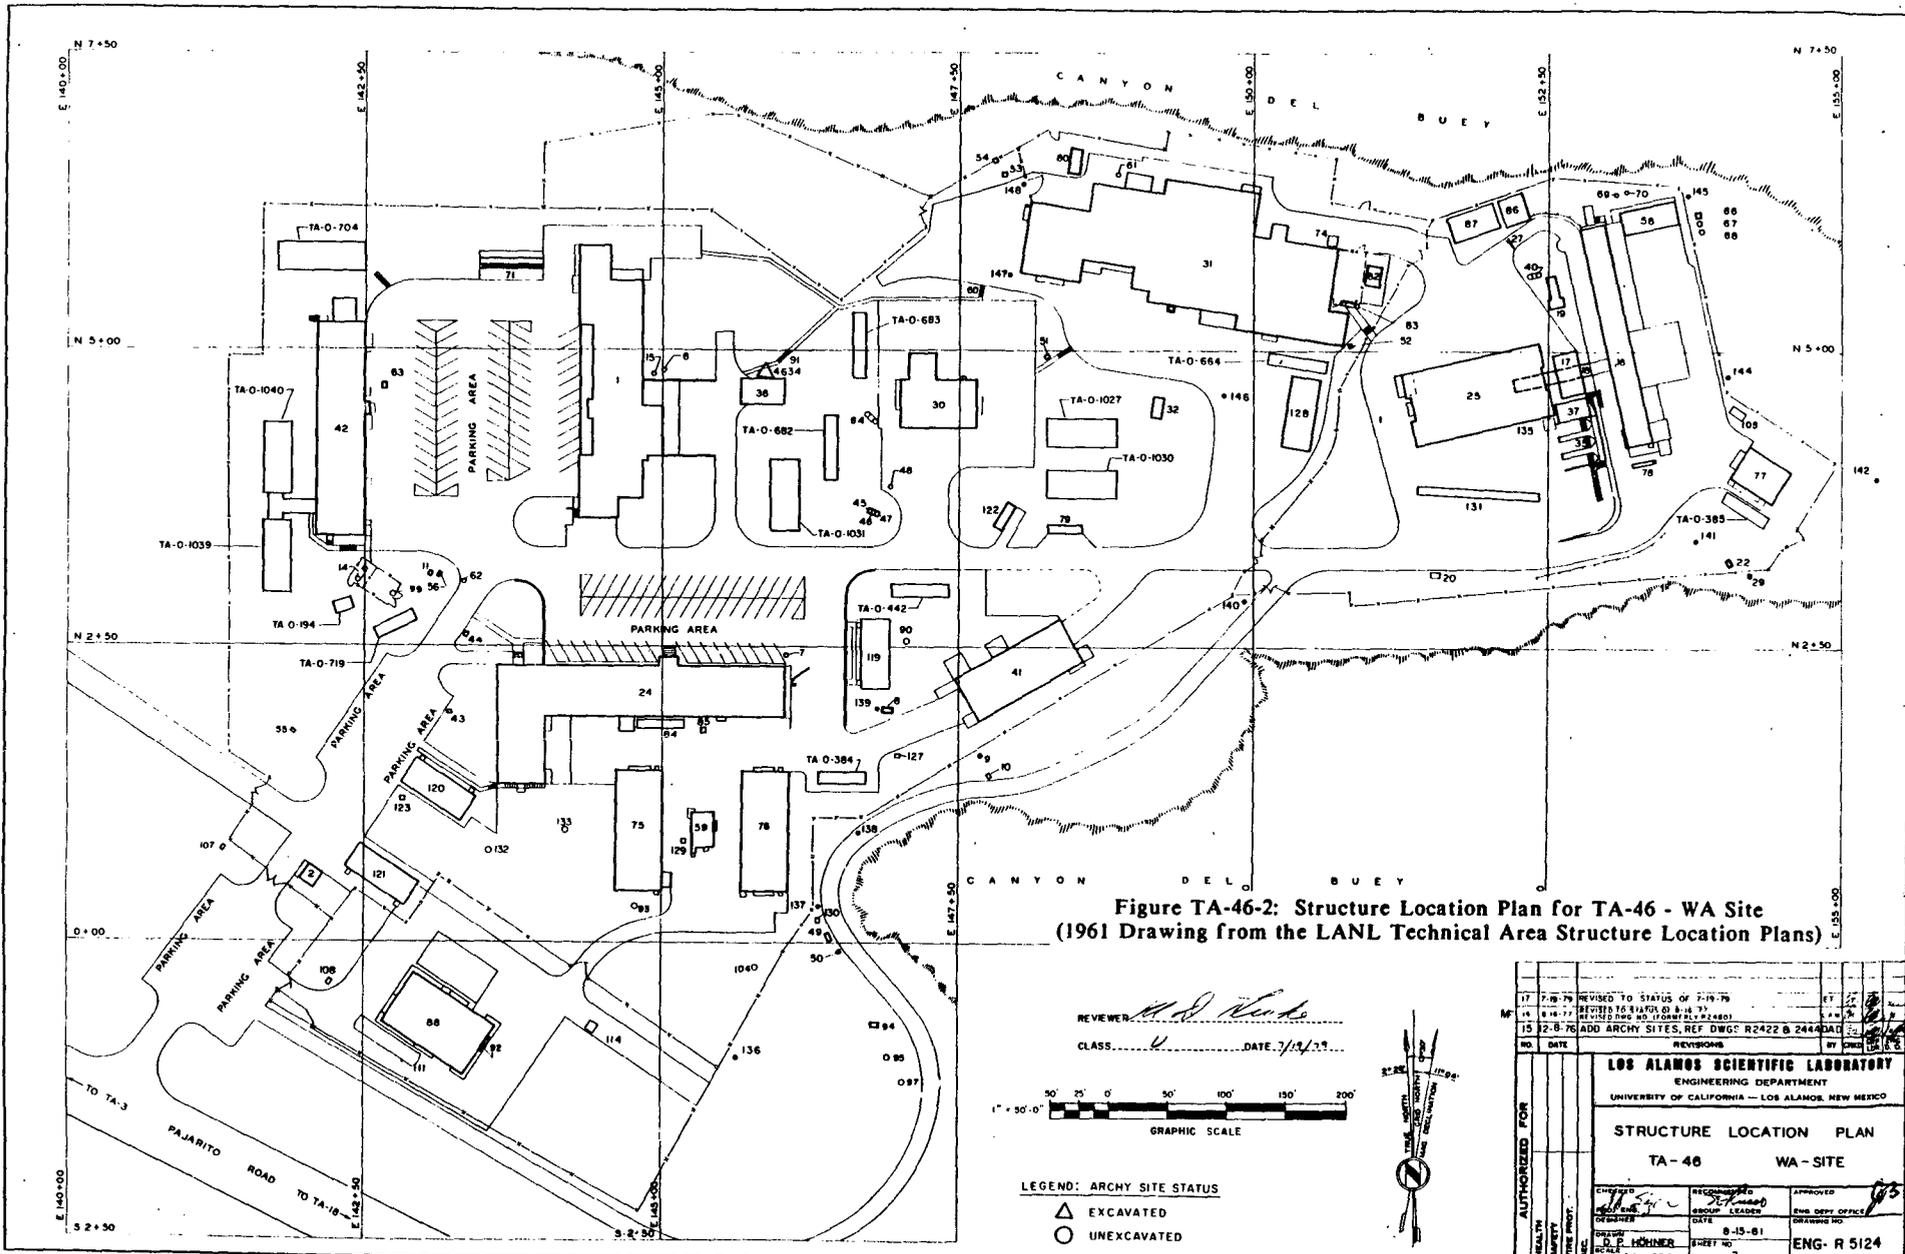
Structure Location Plan for TA-46 - WA Site
